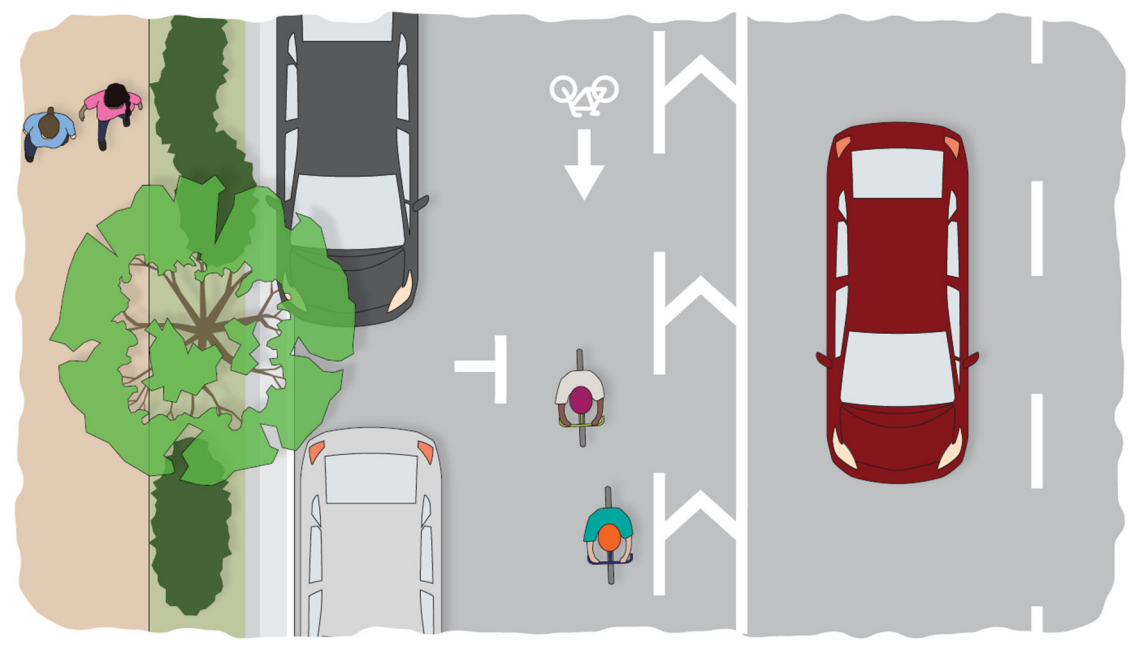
CLASS II BUFFERED BIKE LANE ADJACENT TO PARKING PLAN VIEW
